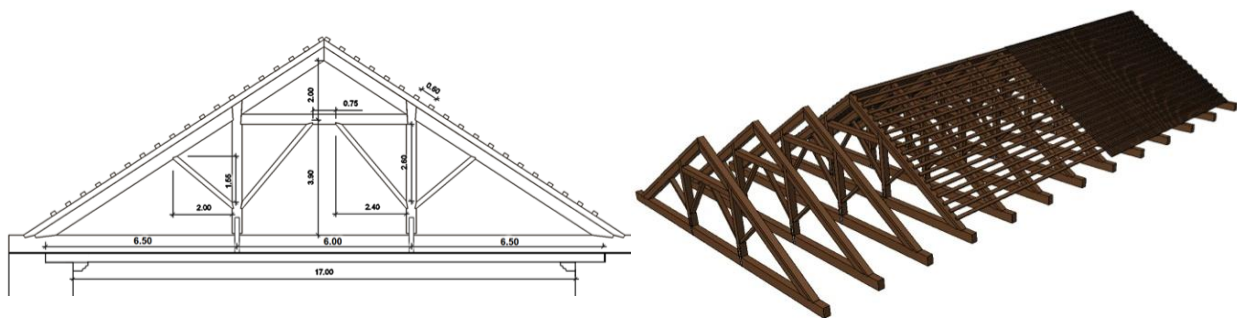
São Roque Church: dimensions of the truss and 3D model of the roof.
